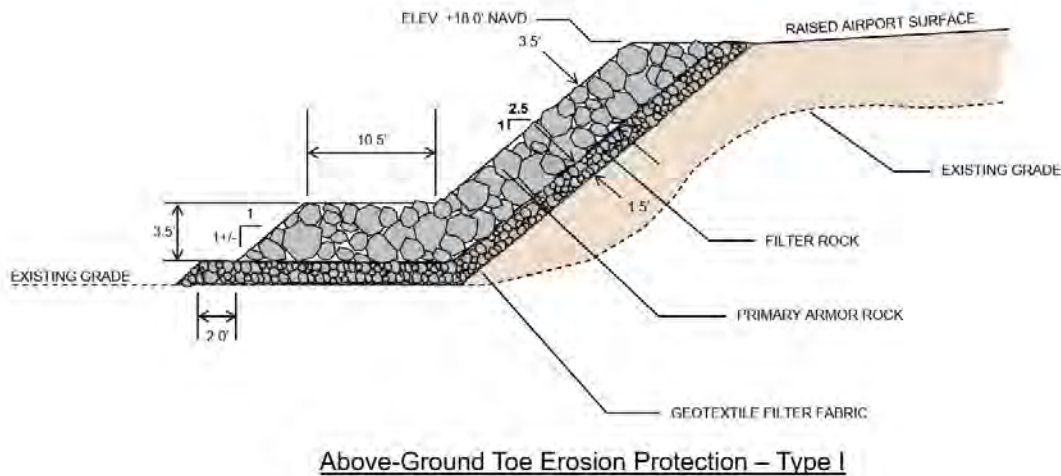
Example of an Above-Ground Toe Erosion Typical Section (Type I 2.5H:1V Concept Shown)
